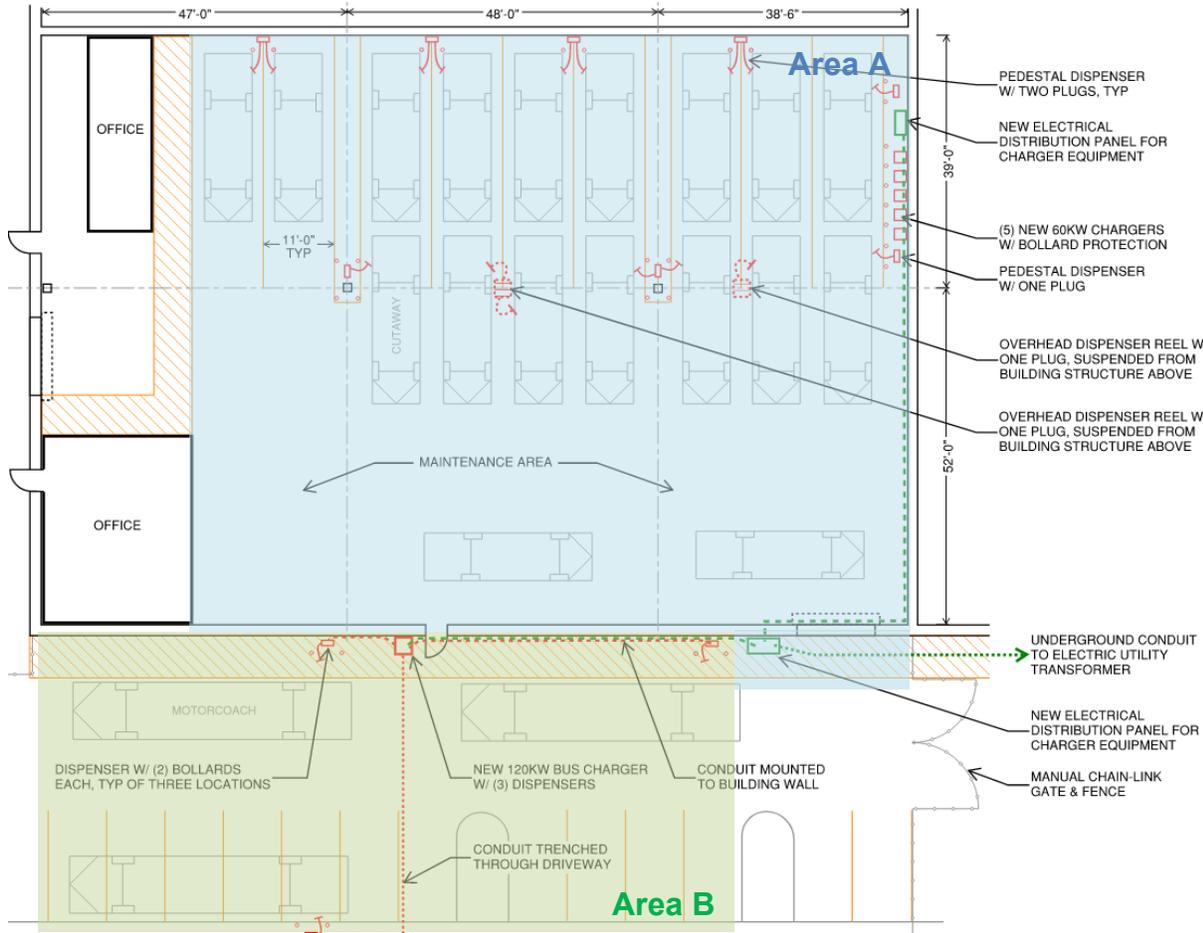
Phasing of Site Plan Concept for SCT Link
